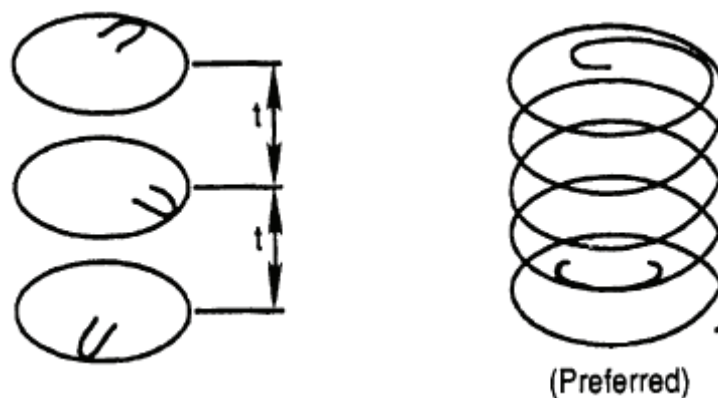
Transverse Ties and Spiral Steel, Showing Hook Anchors and Spiral Laps
